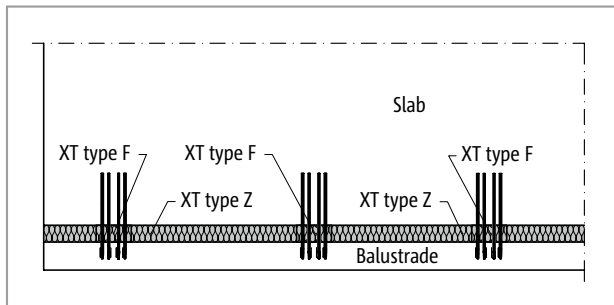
Schöck Isokorb® XT type F, Z: Frontally attached balustrades
